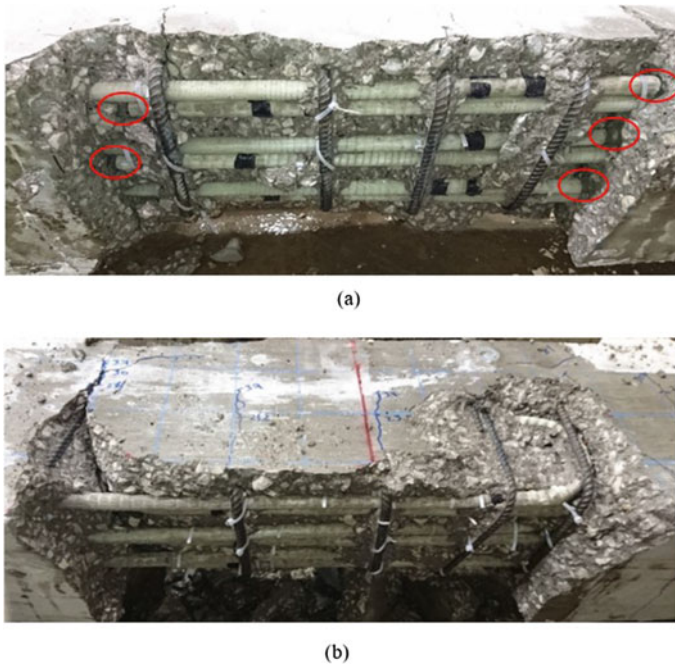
Concrete beams failure modes: a Beams with straight-end bar lap splices, b Beams with hooked-end bar lap splices
